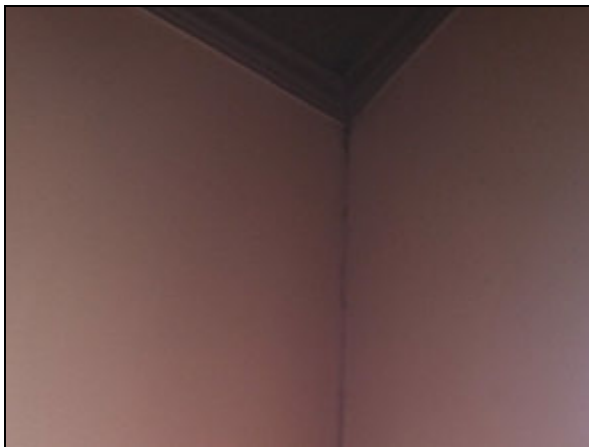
Water damaged wall, ceiling, and crown molding above the drop ceiling in the southeast section of the main room.
